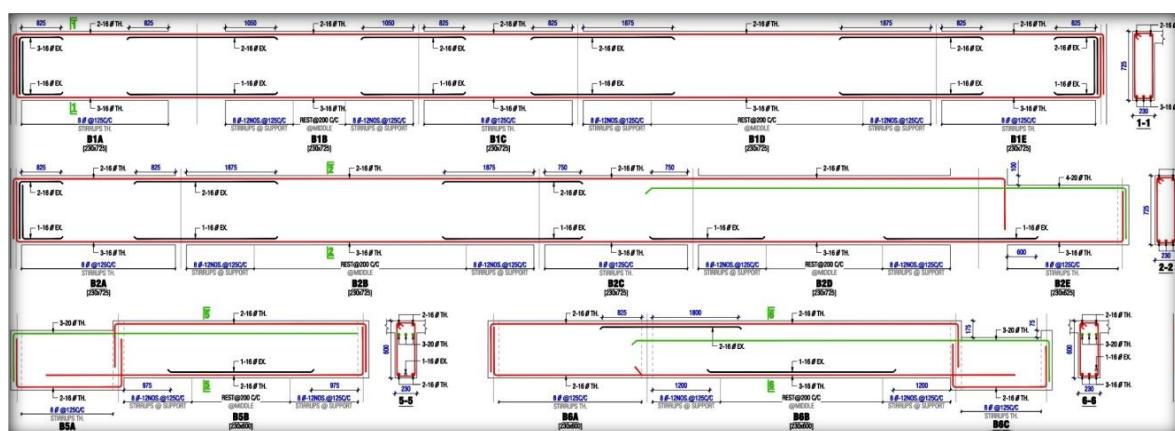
Reinforcement Details of beam B1,B2 and B3
